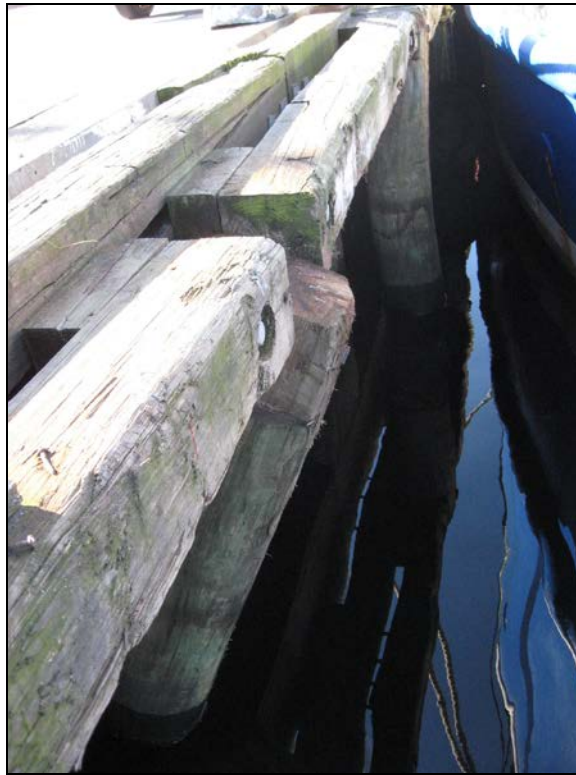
Broken fender pile near Station 8+06 proposed to be replaced.
